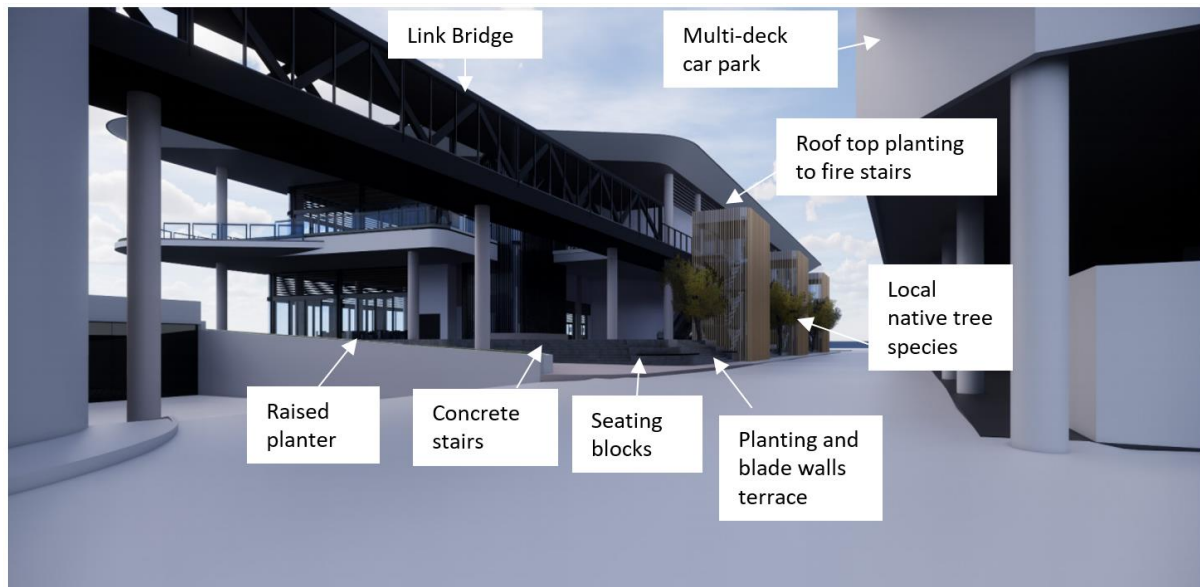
| Photomontage of 'The Laneway' looking west (Source: Applicant's RtS)
